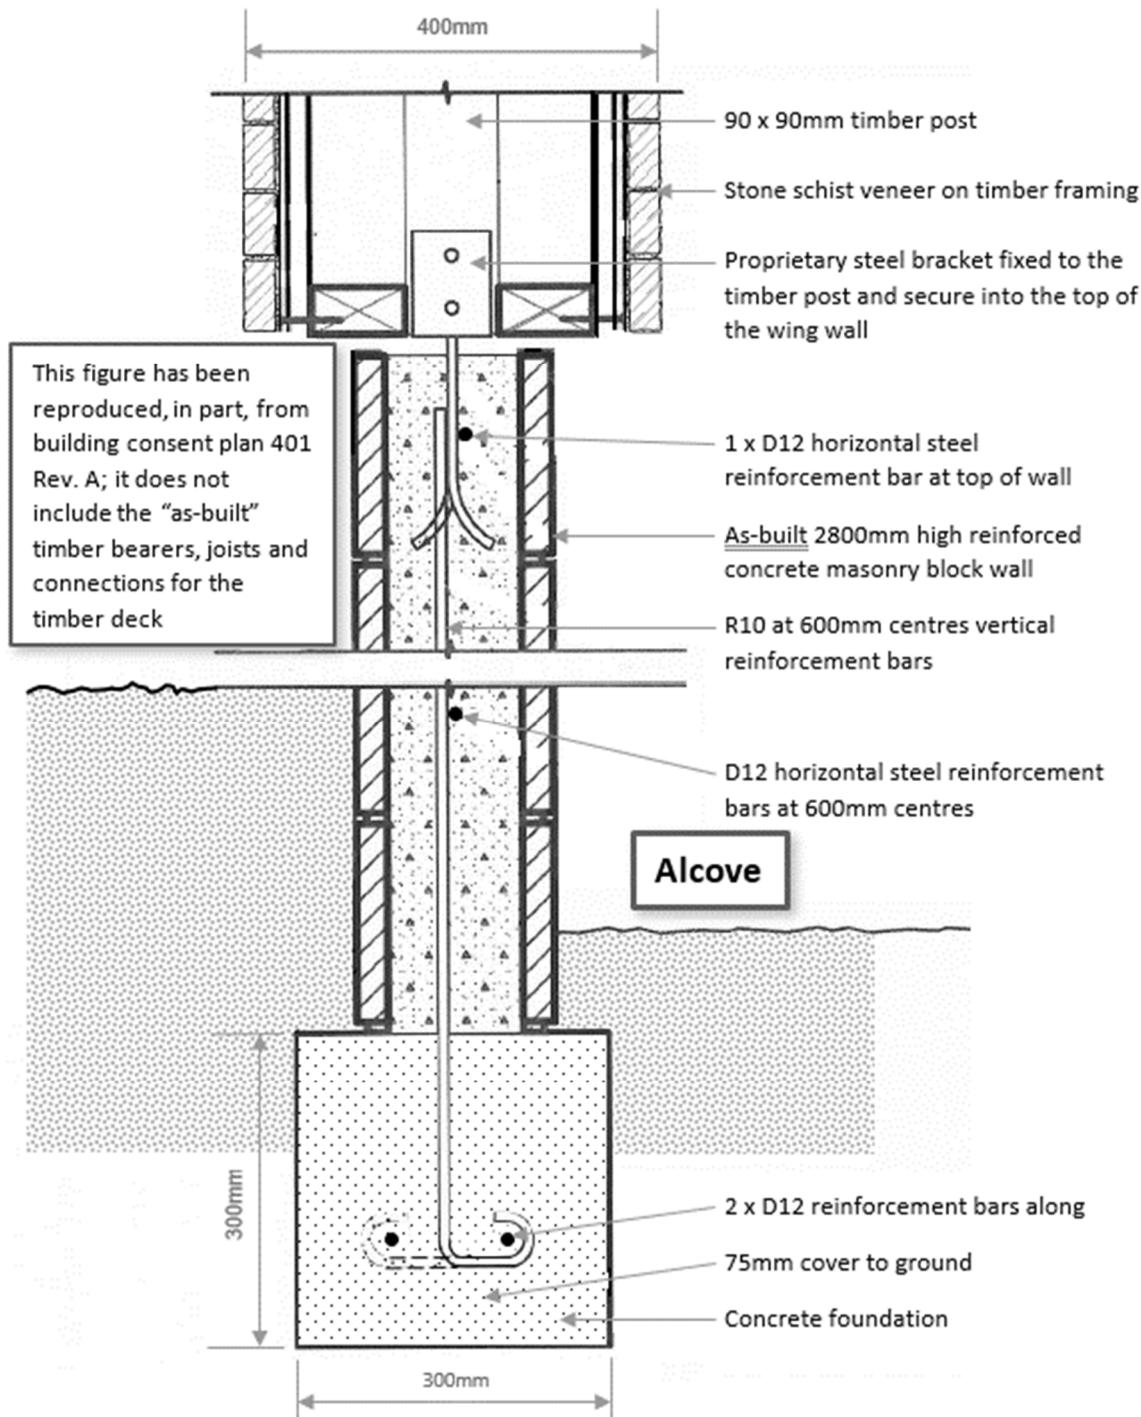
Wing wall excluding timber deck (not to scale)⁴¹
